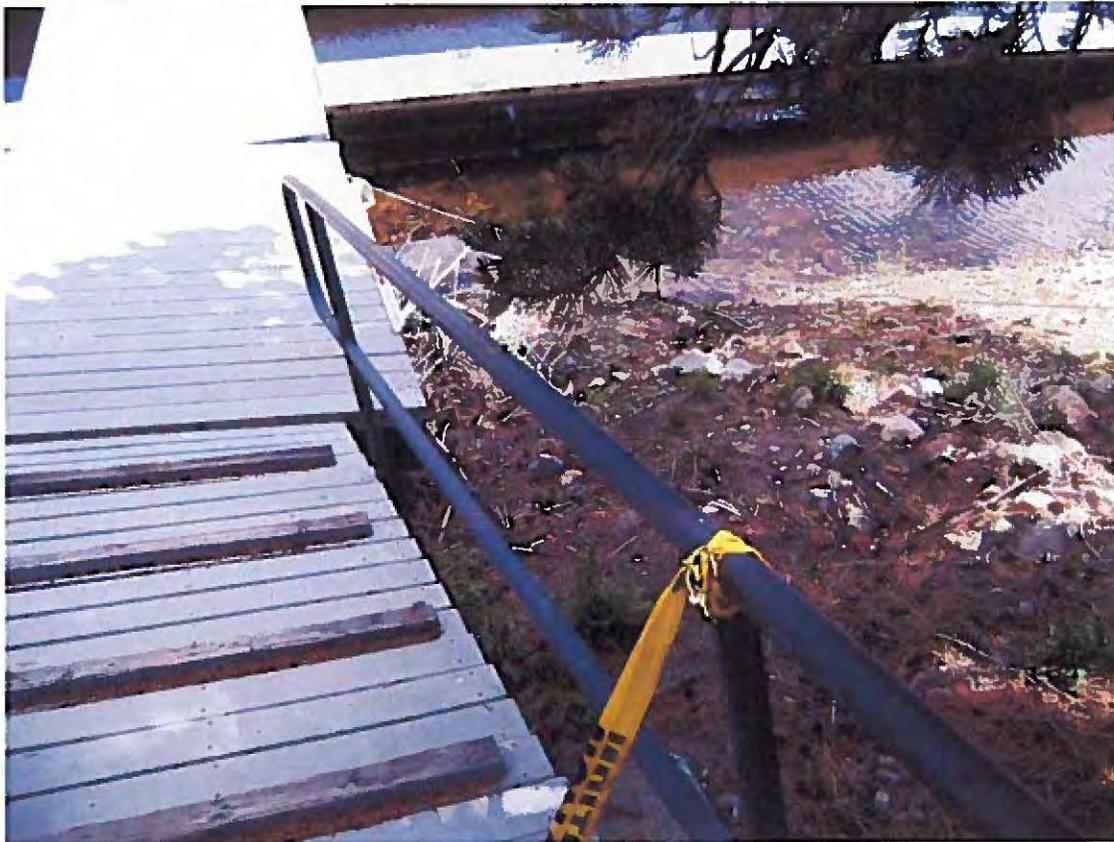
From same location as Photograph No. 13, but looking on the west side of the second ramp west of office.
